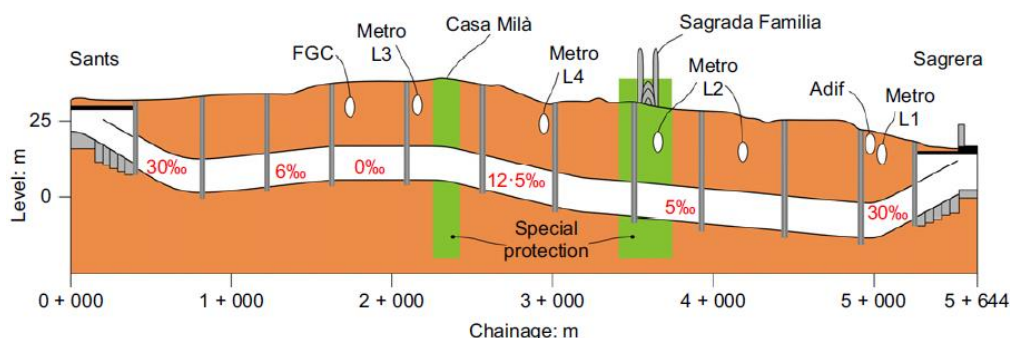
25.- Longitudinal profile of the excavated tunnel. (Ledesma & Alonso, 2010)
